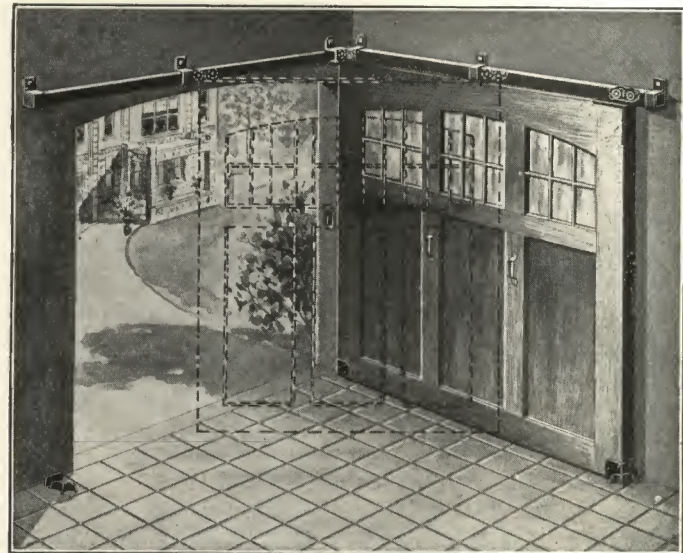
Illustration of interior of garage doorway equipped with Single door SlidaSide CC Hardware. Location of Bolt Holes and Bracket Spacings are given on page 132.
